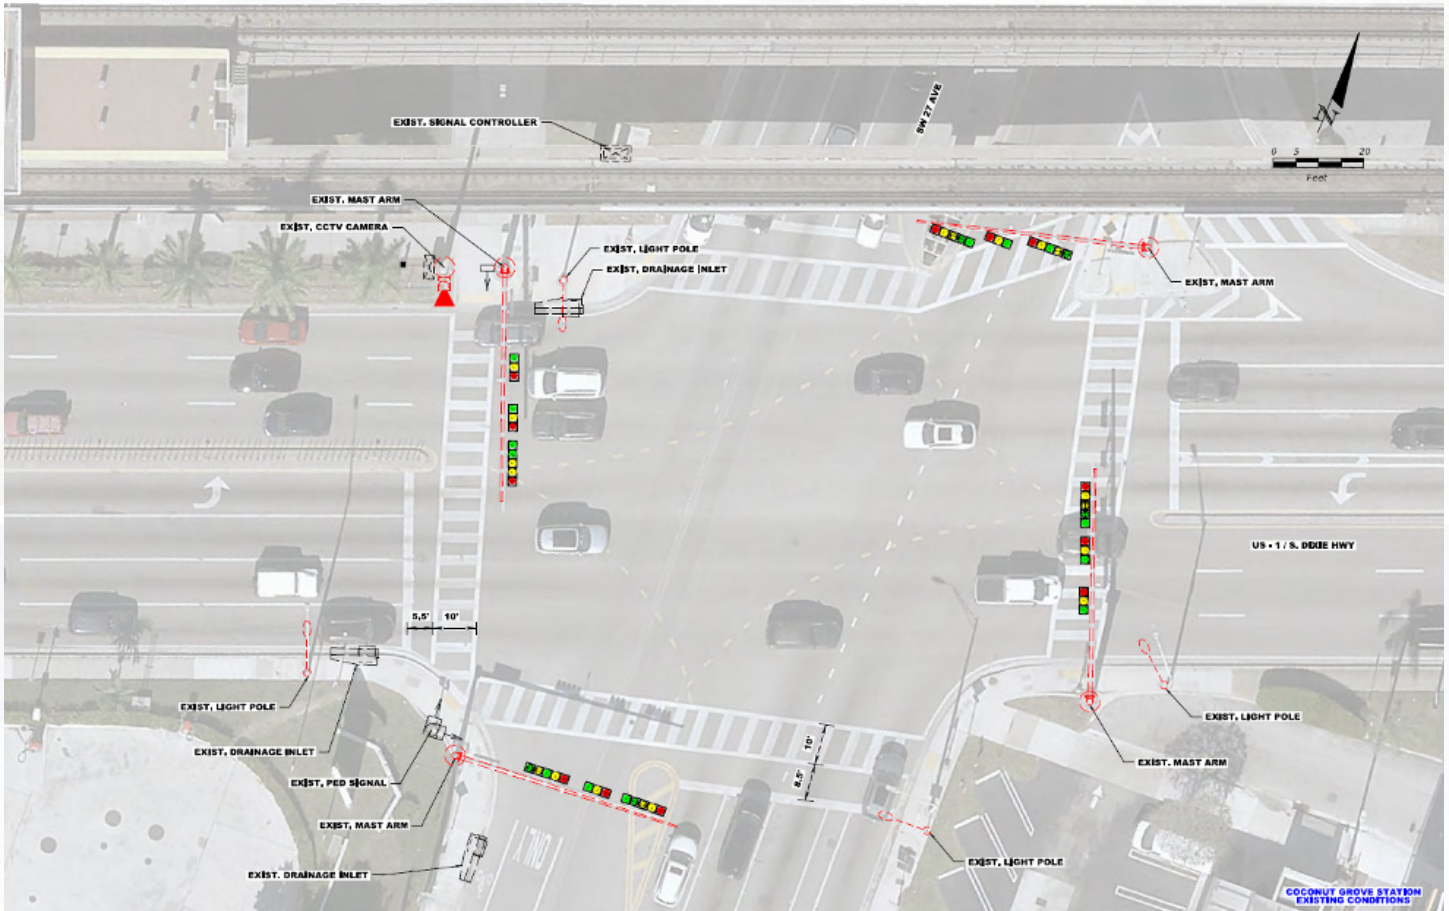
Existing Conditions at Coconut Grove Metrorail Station Intersection at US-1 and SW 27th Avenue
